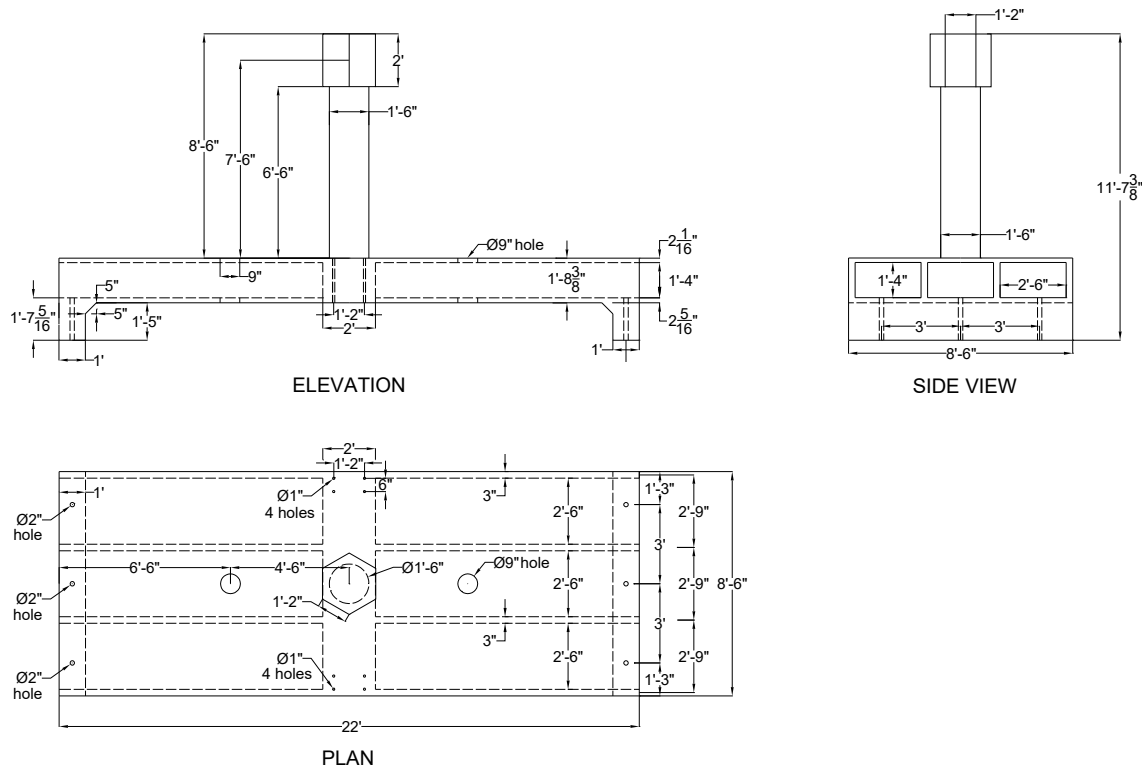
Different views of the 1/4-scale subassembly specimen.
